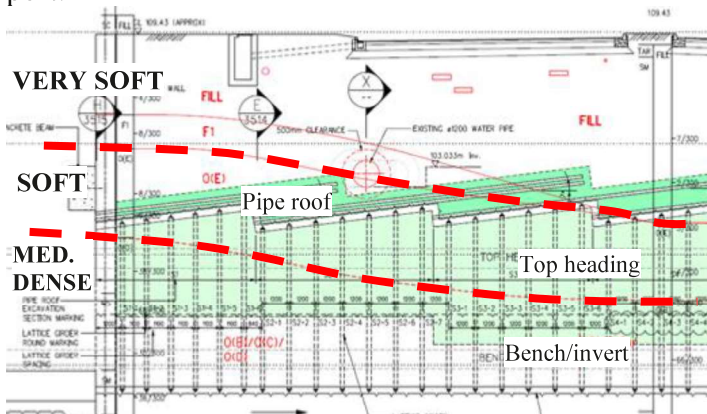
Alternative Construction Method – Mined SCL Tunnel.
